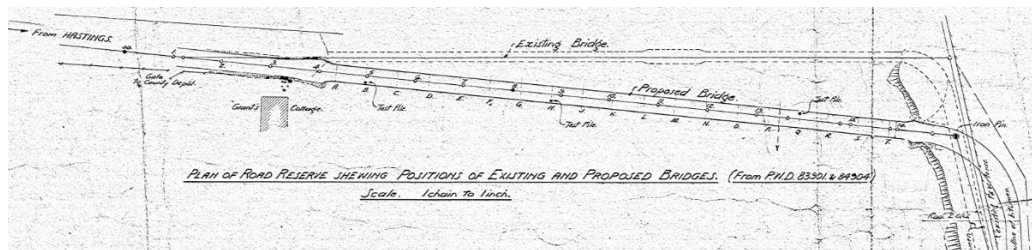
Plan view showing the proposed Redclyffe bridge constructed in 1933 and the bridge that existed prior to it.
